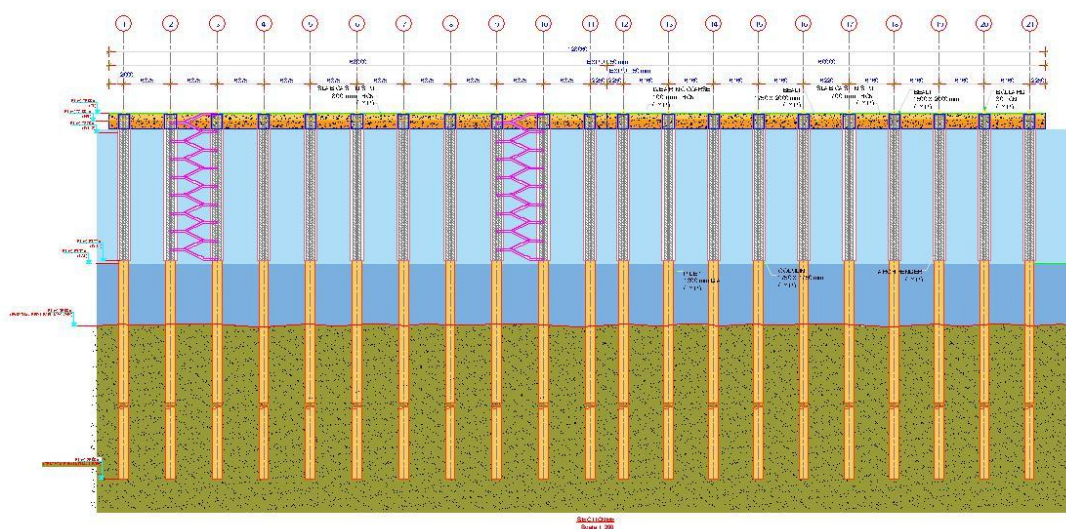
7 Cross-Section of Transfer Bay(Section-EE) of Ship Repair Facility in Varanasi
